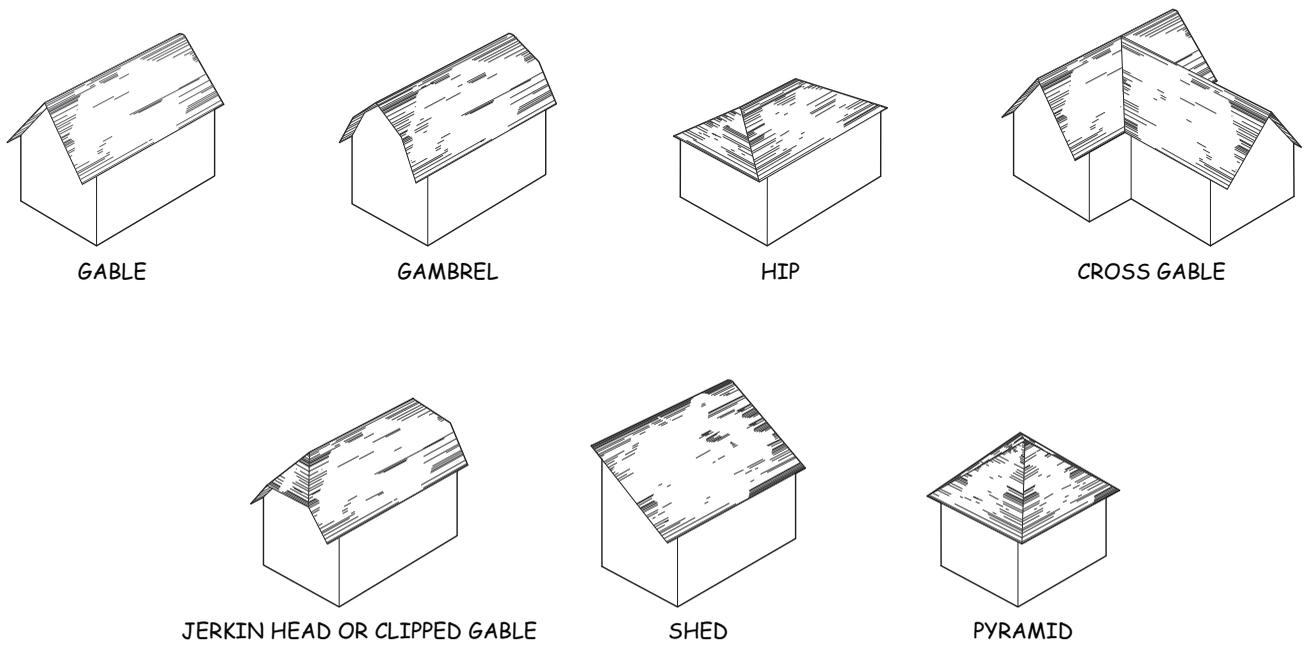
This series of labeled drawings shows common roof styles for log buildings.
